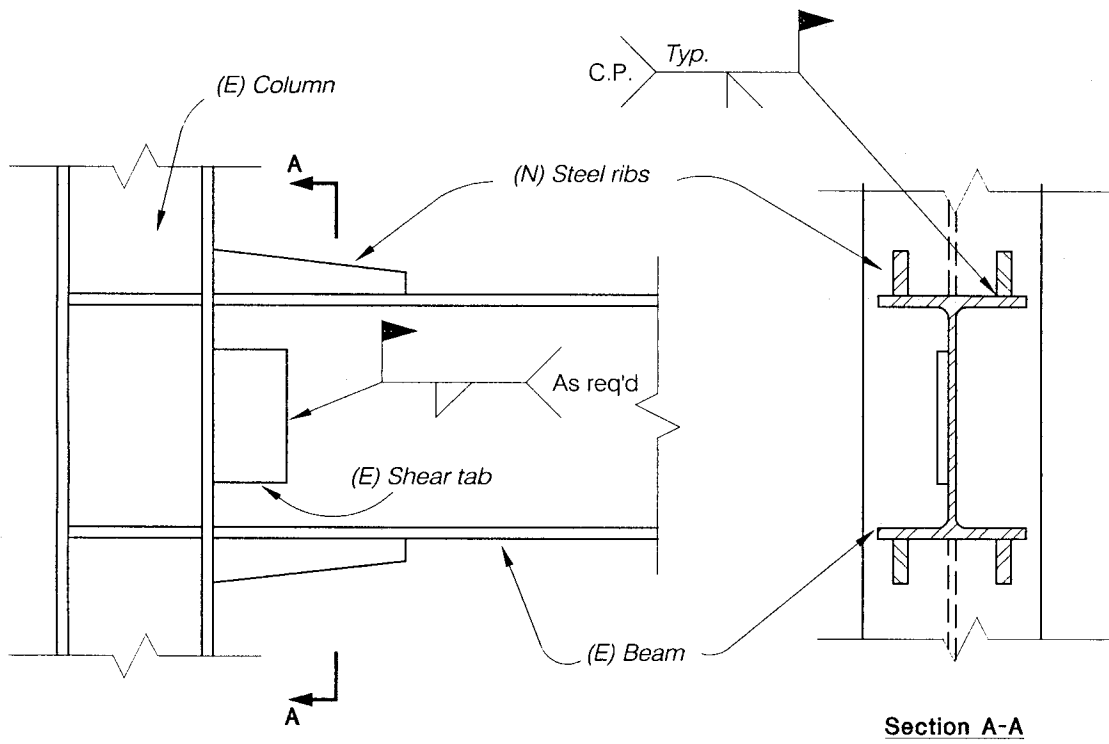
Strengthening a Pre-Northridge Moment Connection
